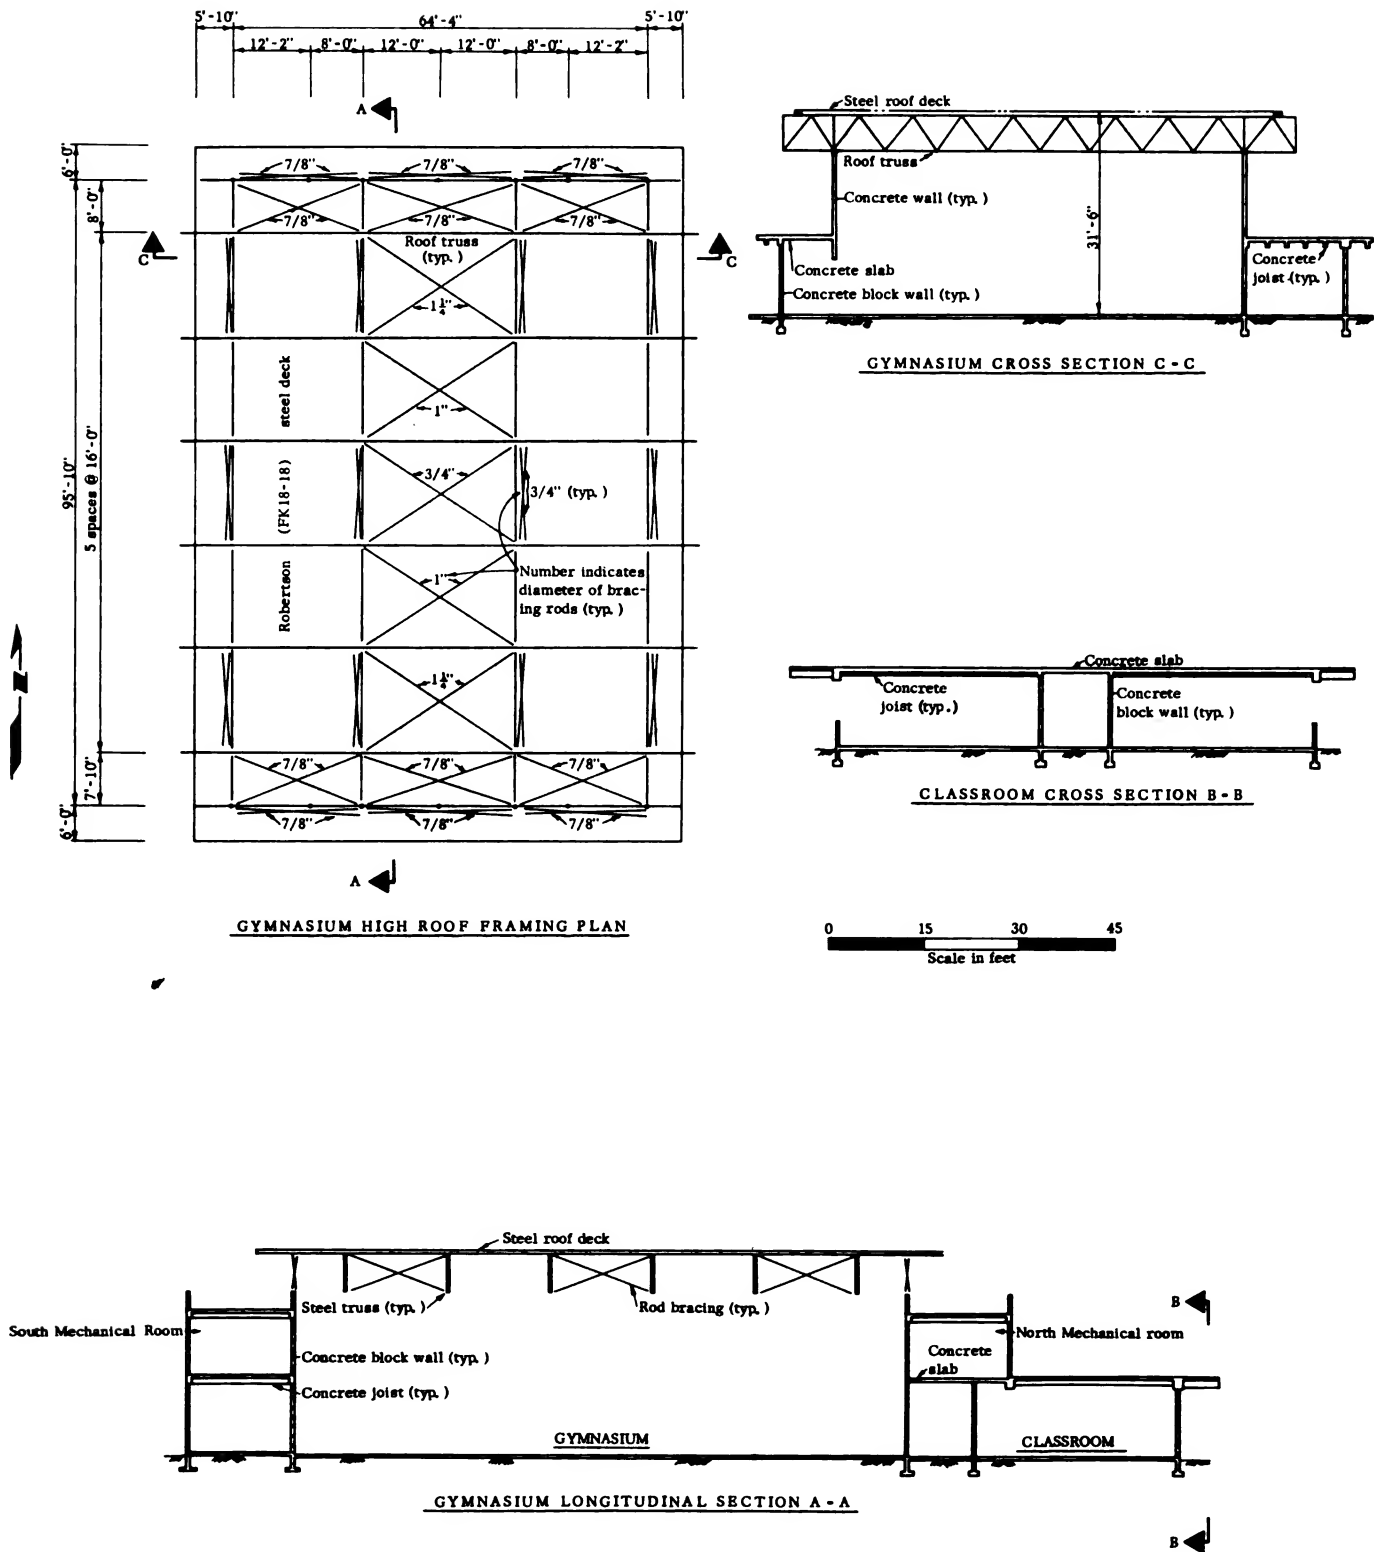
San Fernando Valley Juvenile Hall. Boys' school and gymnasium. High roof framing plan, gymnasium cross section C-C, classroom cross section B-B, and gymnasium longitudinal section A-A.
